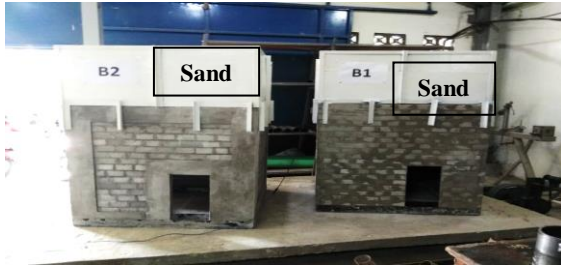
Specimen with additional uniform load using sacks filled with sand (sandbags).
